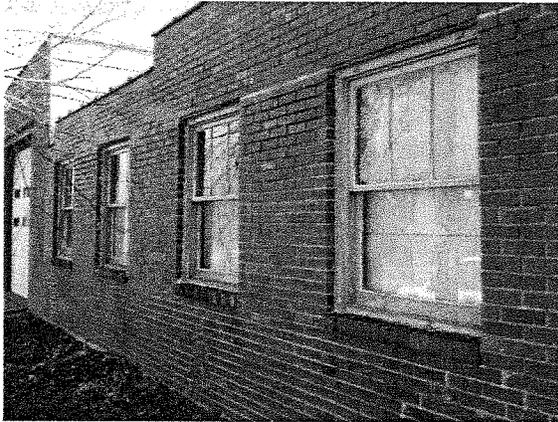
HA 4 – window caulk on exterior windows on north side of former auto repair shop
